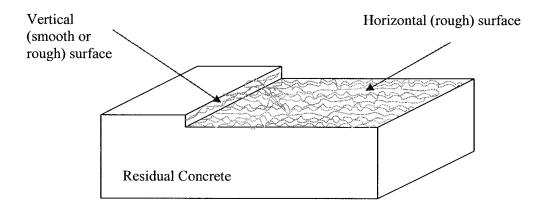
Illustration of a Typical Roughen Section (Minoru et al., 2001)
